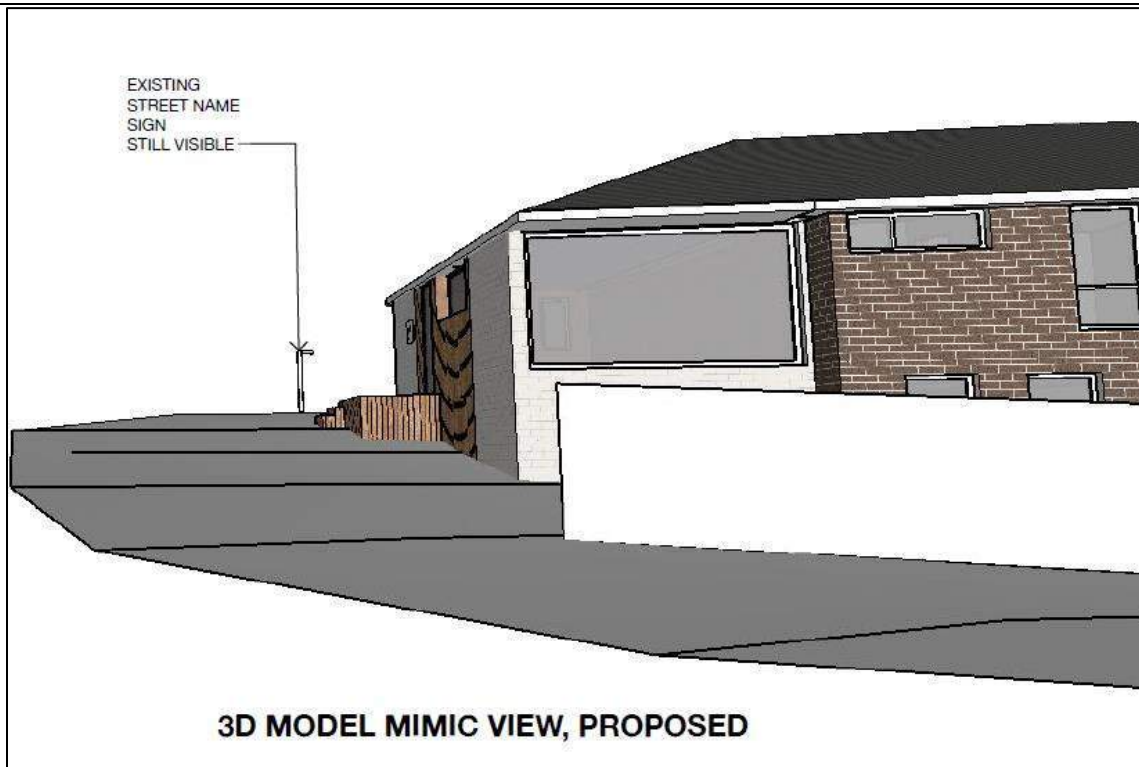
3D Model of the proposed view looking north-west towards the intersection of Lomond View Drive and Bordin Street.
